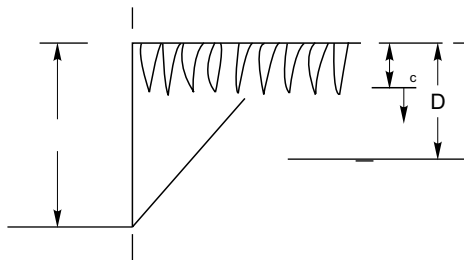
Retaining wall with tension cracks in the backfill.
